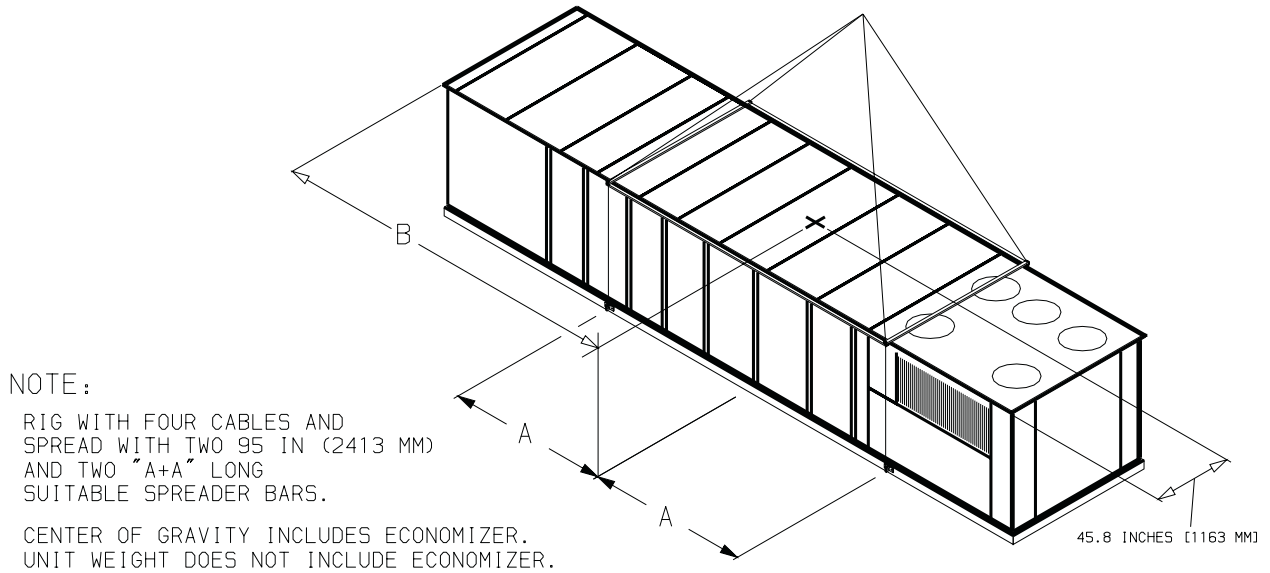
Rigging Label — Size 055-105 Units (Standard Chassis)
